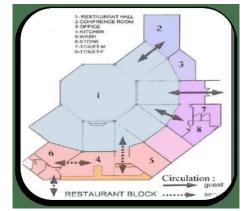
Restaurant plan (Source: Isckon Temple Delhi.pdf
